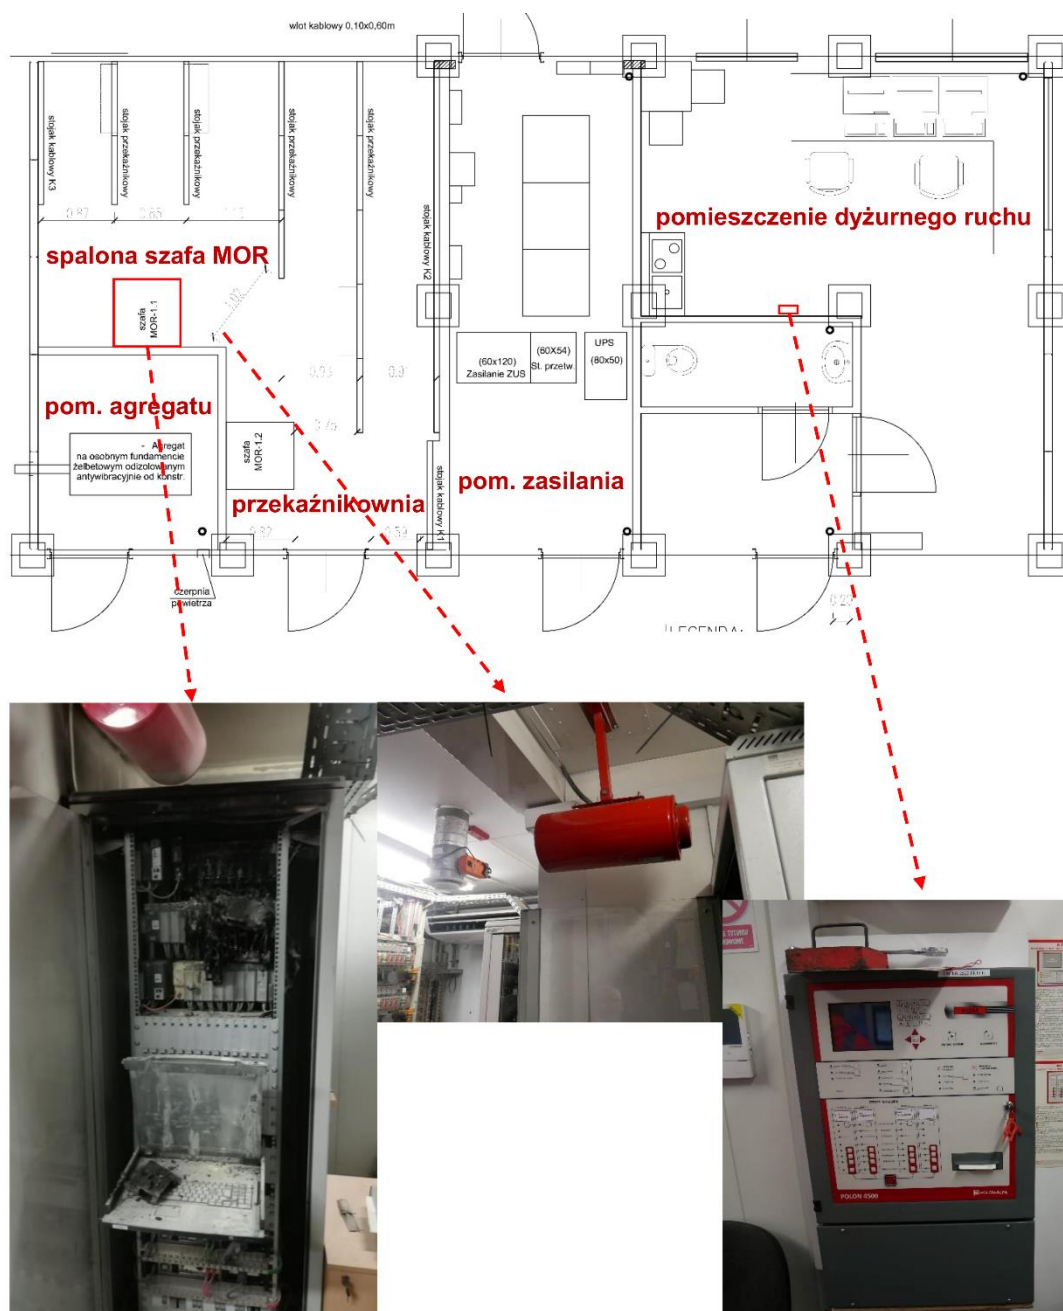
Sketch of the layout of the rooms and some equipment of the Lsz control room
